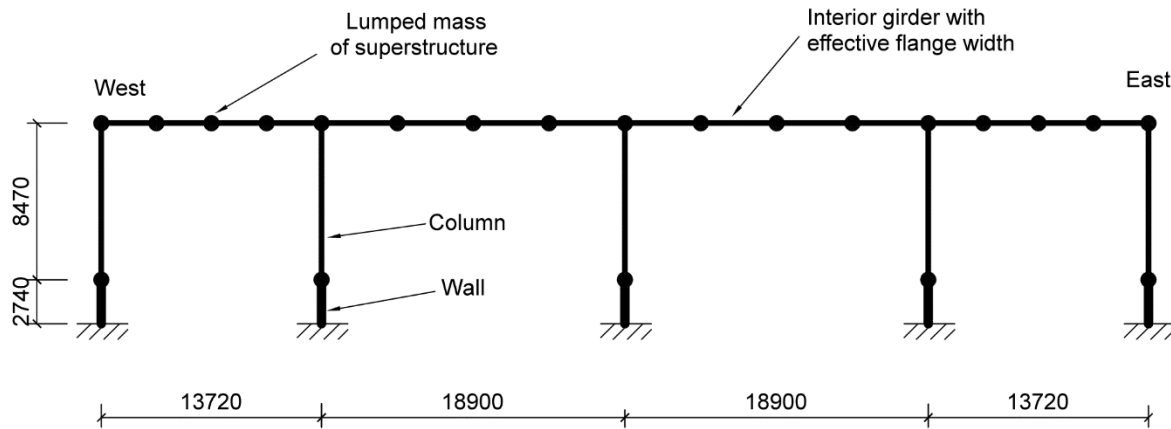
Finite element model of Bridge #5 in the longitudinal direction.
